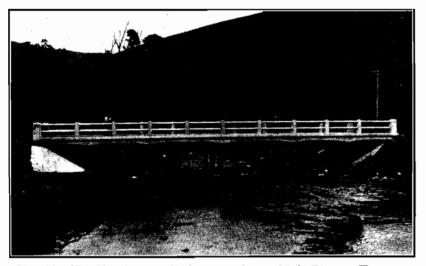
Showing new bridge erected over Little River at Taggerty.
